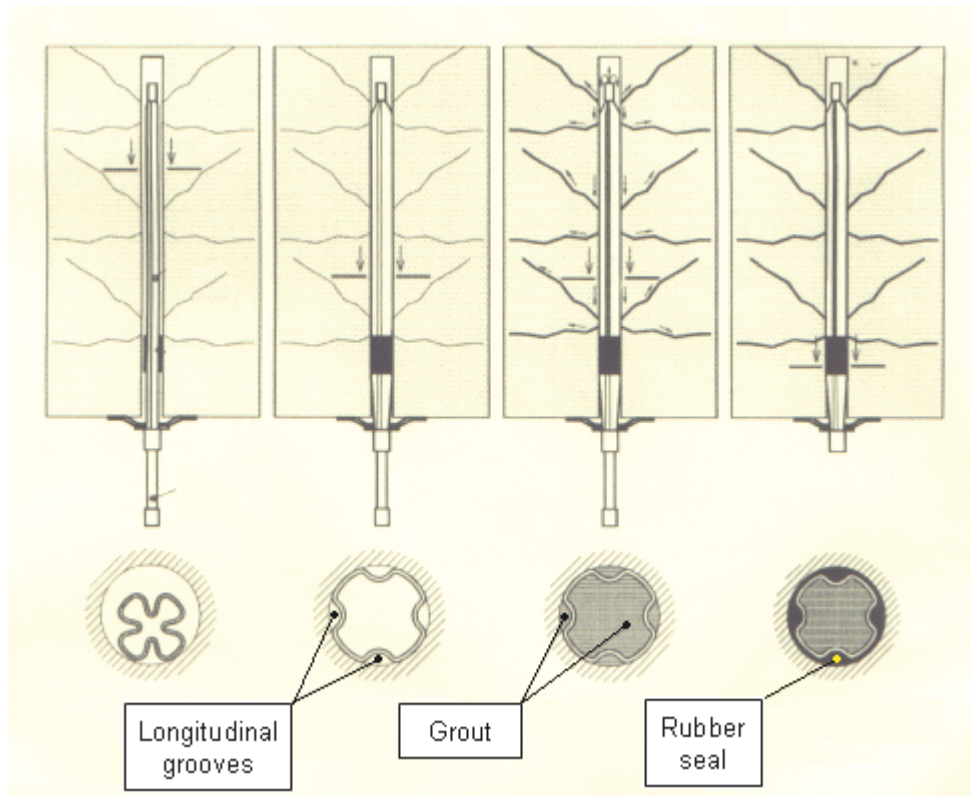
Cross-sectional and vertical-sectional views of pakran bolt [62]
